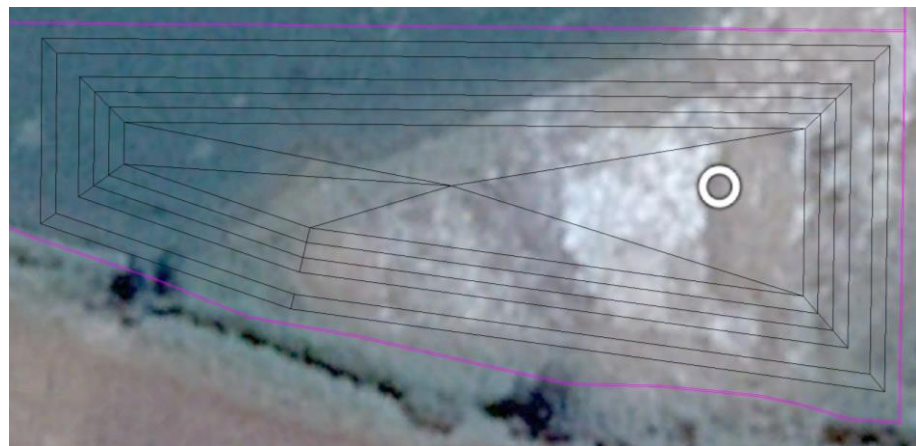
Moving back to Zone B the overfill placed in Zone A and capping the entire site
